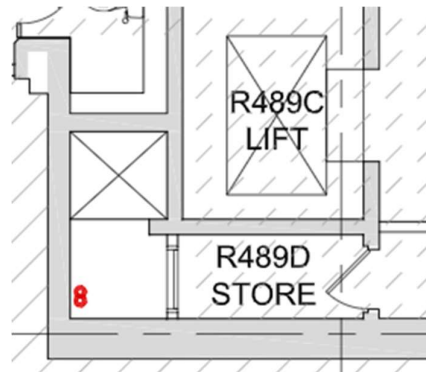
Floor plan showing the penetrations into the floor slab (shown in figure at Level 5 but applies to Levels 3 to 12) (Source: Architon LLP)
